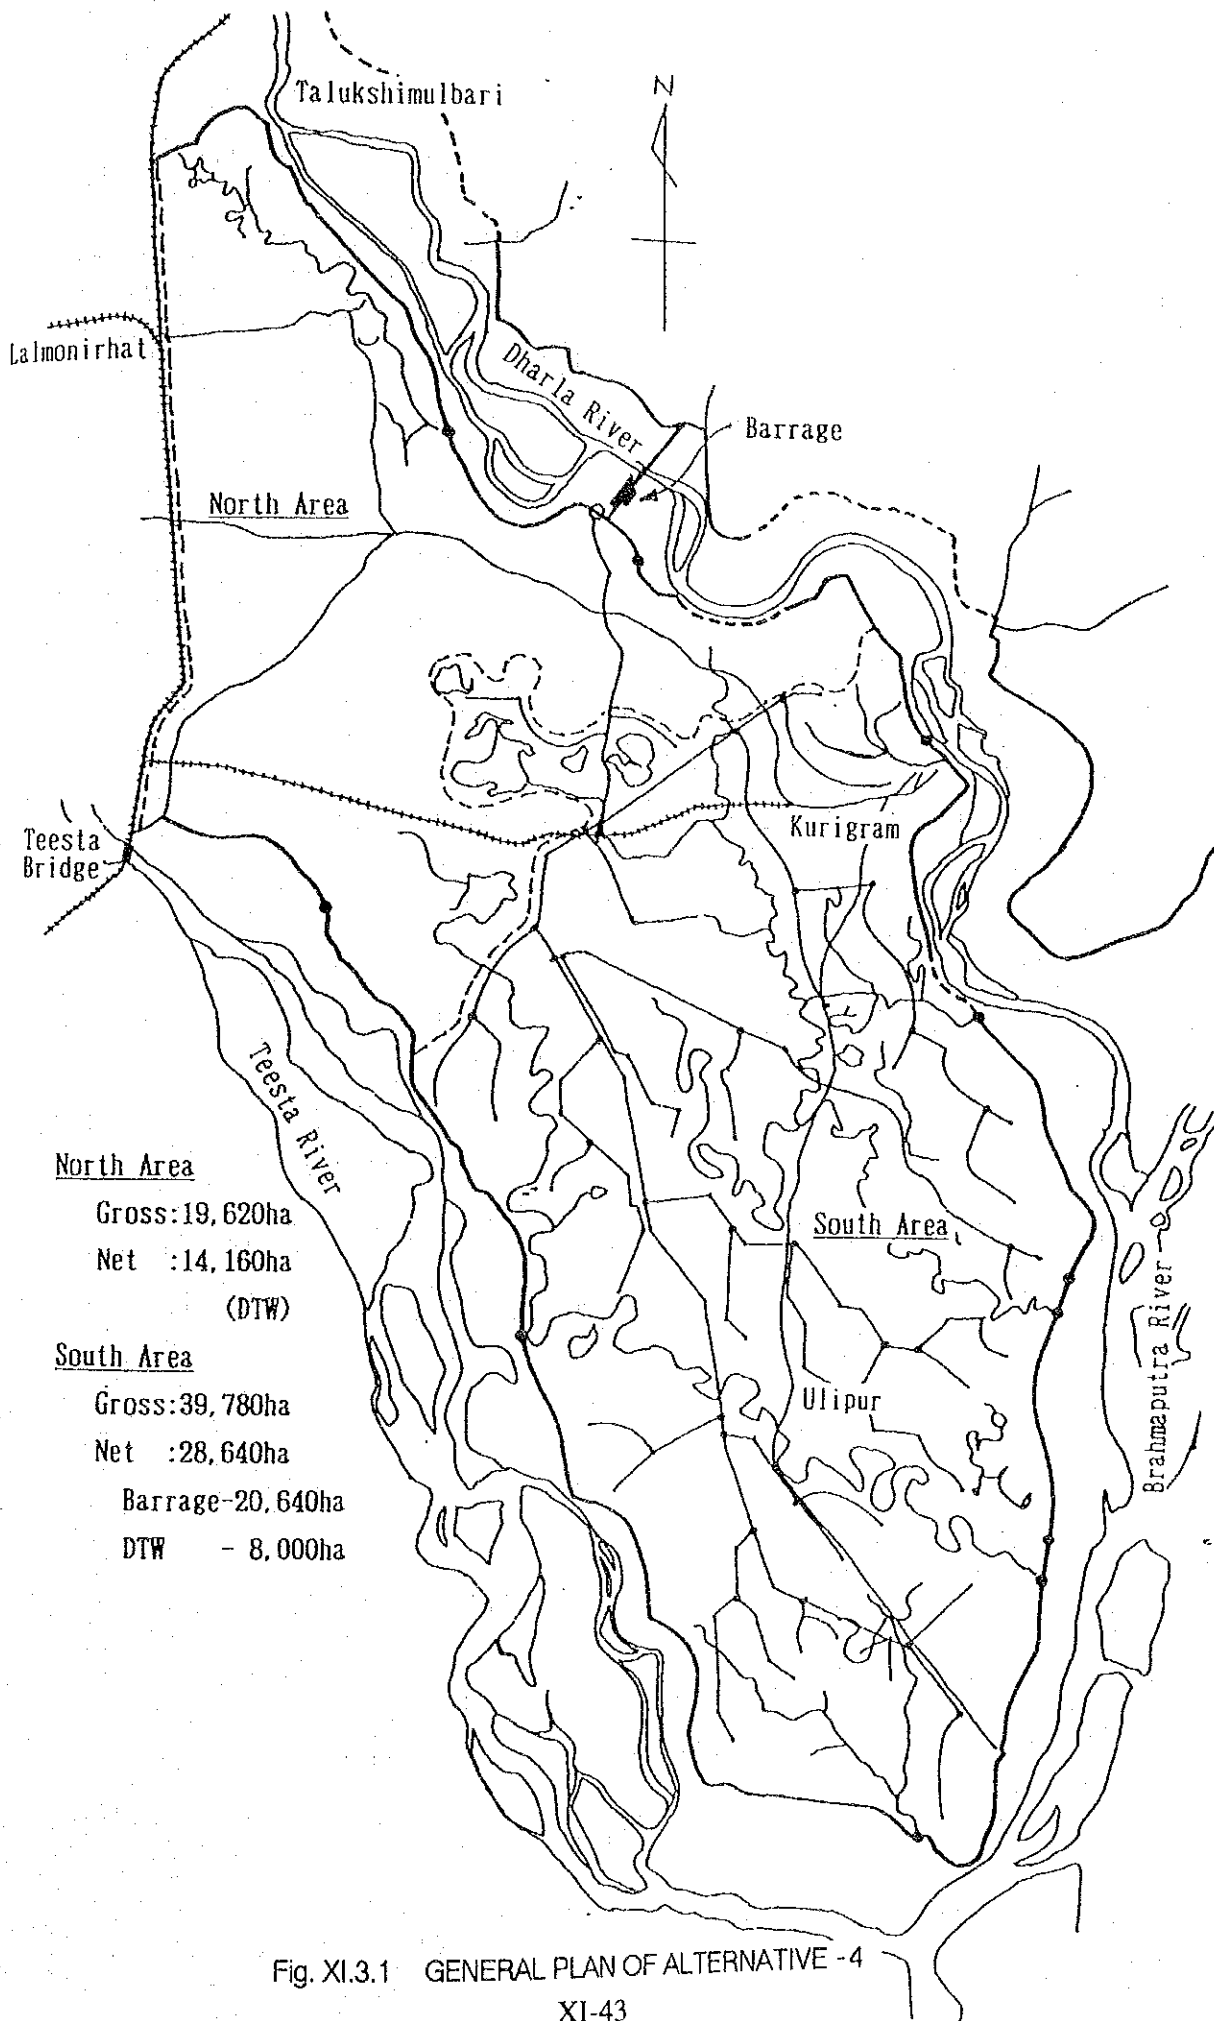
GENERAL PLAN OF ALTERNATIVE -4
